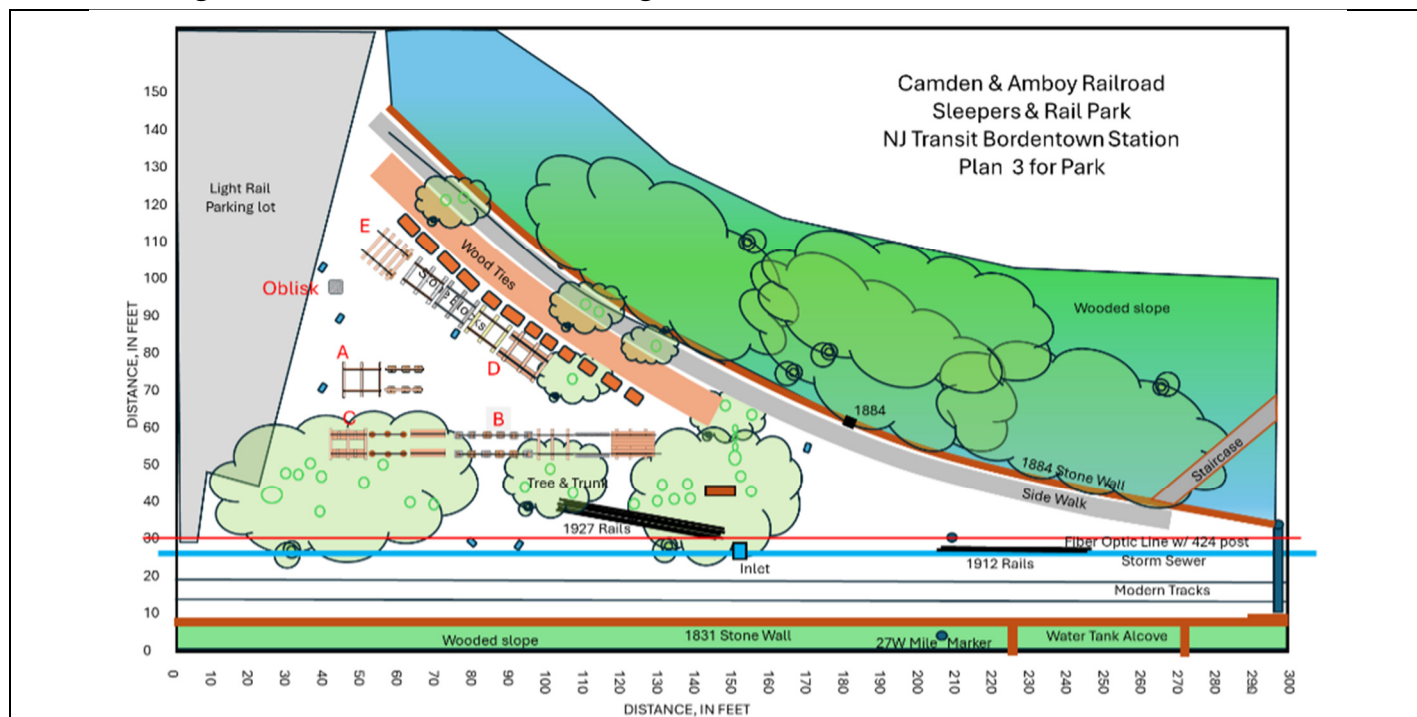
PLANS FOR THE CAMDEN & AMBOY RAILROAD HERITAGE PARK NEAR THE BORDENTOWN LIGHT RAIL STATION - Plans show the location of the 14 styles of railroad tracks built by the C&A RR during 1831 and 1837.
